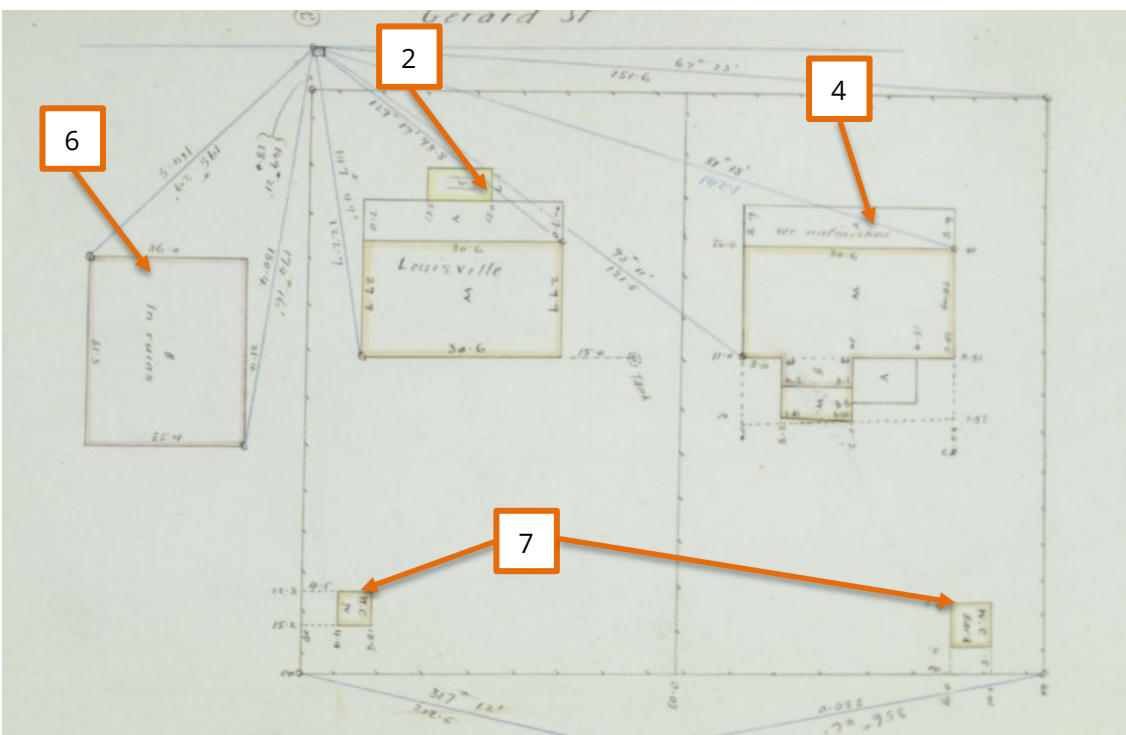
Sydney Water Field Book plan of Lots 77, 79 and 81 Gerard Street dated to 1892, with the study area outlined in orange (Source: Sydney Water Archives, PWDFB2133 p. 23)
